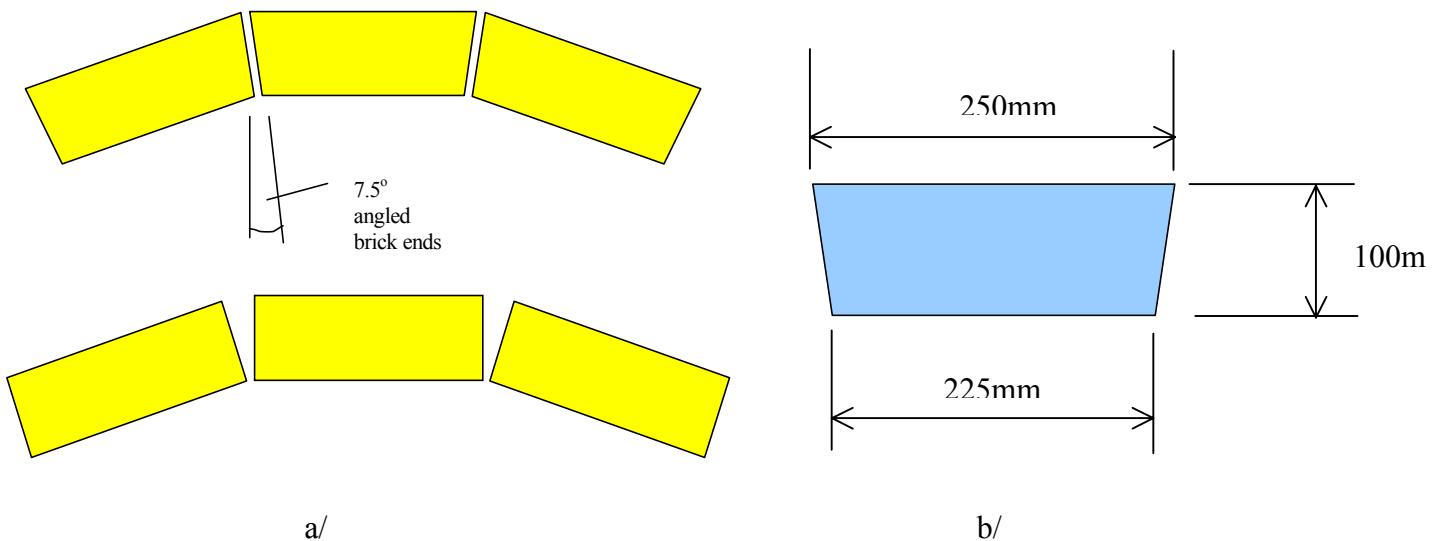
a/ where bricks are cast and fired specially for tank construction, they can be cast with a slight angle at each end. To minimise the amount of mortar used the bricks should be cast with an angle of 7.5° on each end of the brick b/ showing actual dimensions of brick cast for tank construction
